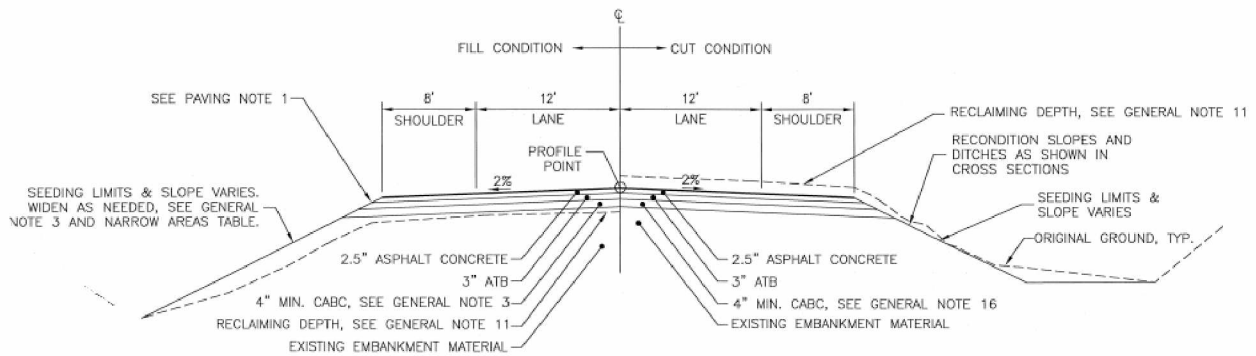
Healy, pavement structure III (image courtesy ADOT&PF)
